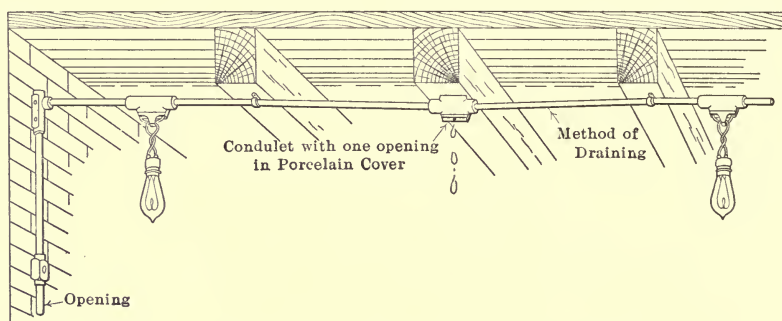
PROVISION FOR DRAINING CONDUIT.
